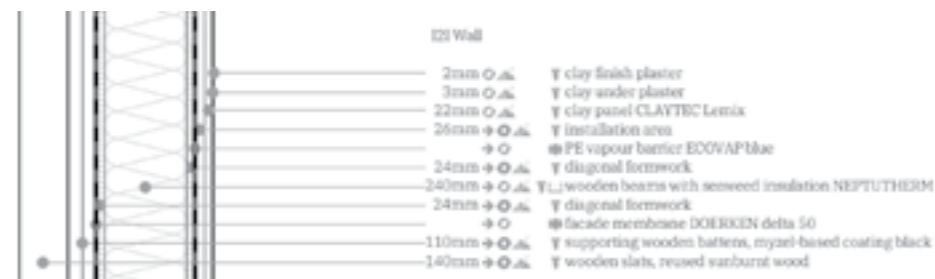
8. Wall construction of the RoofKIT extension
